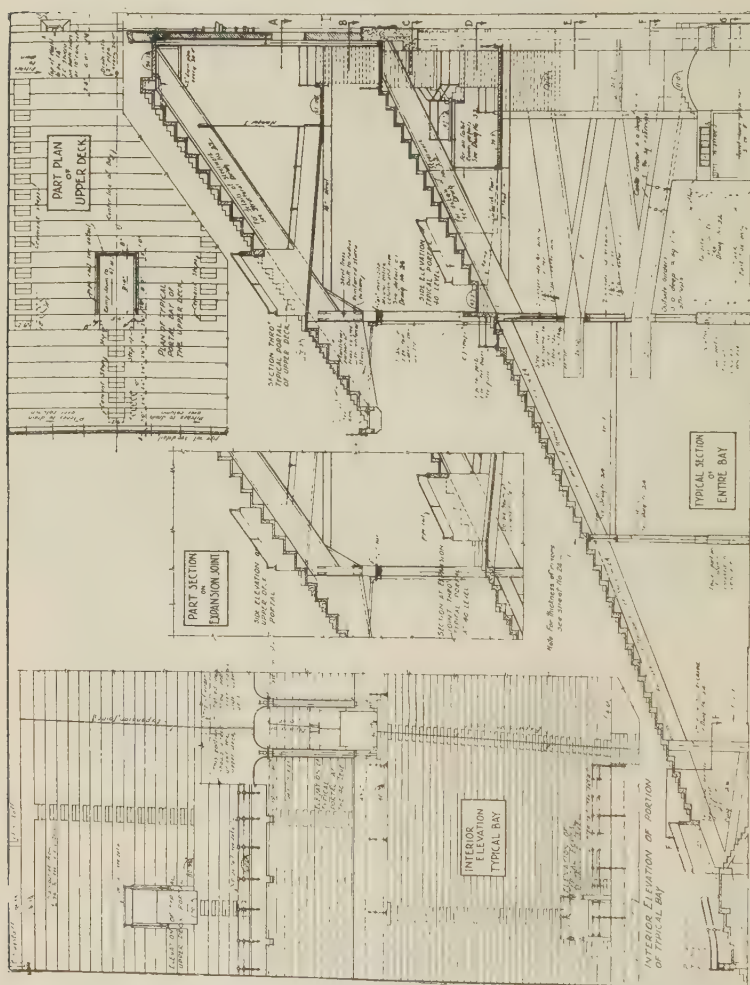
TYPICAL SECTION OF ENGINE BAY.
